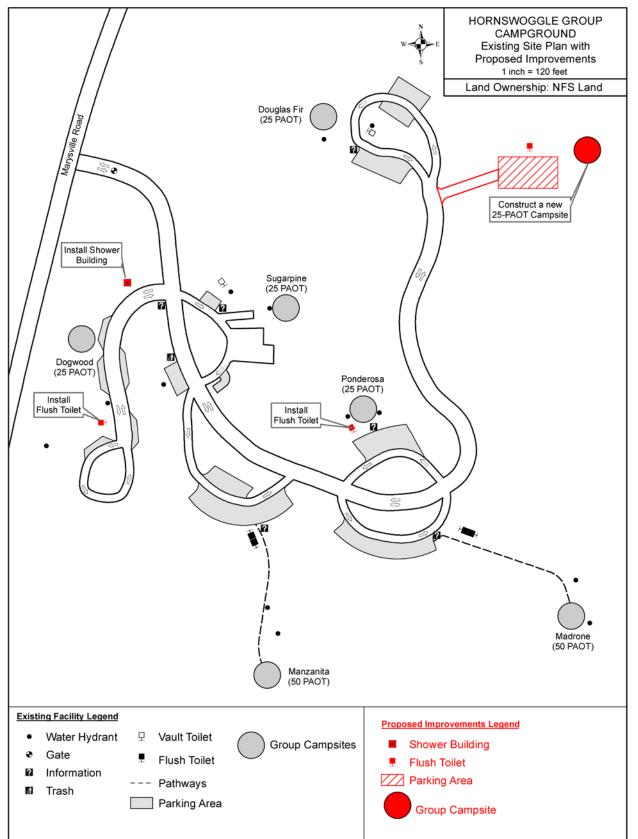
Existing site plan with proposed improvements for Hornswoggle Group Campground.
